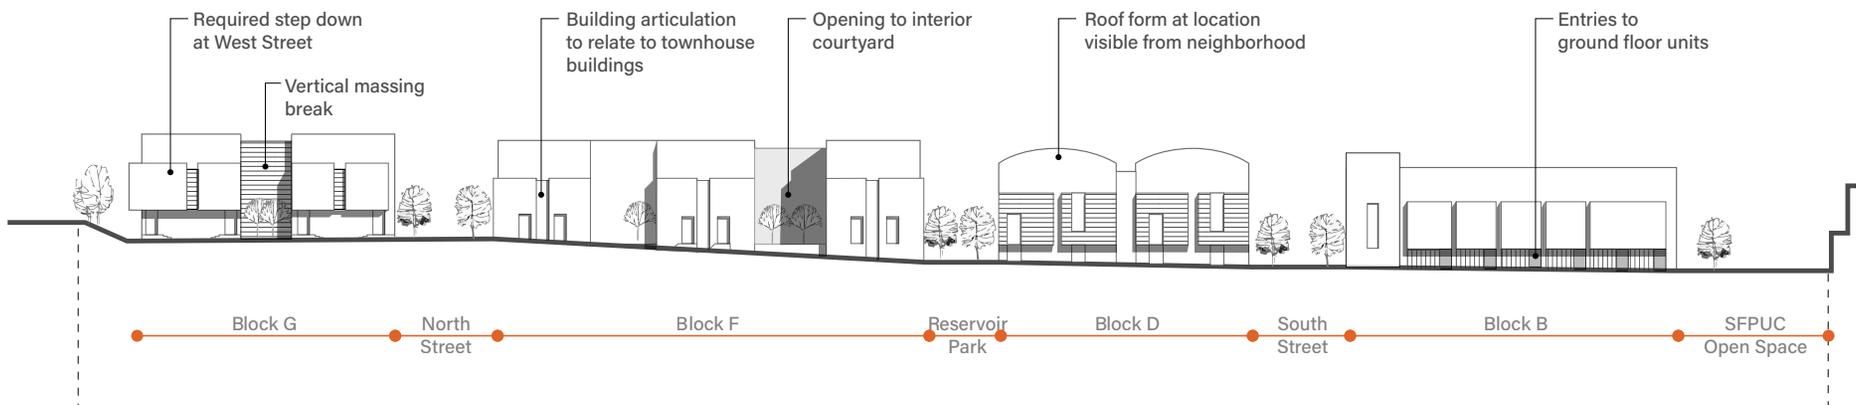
Conceptual Streetwall Character - East Side of West Street
